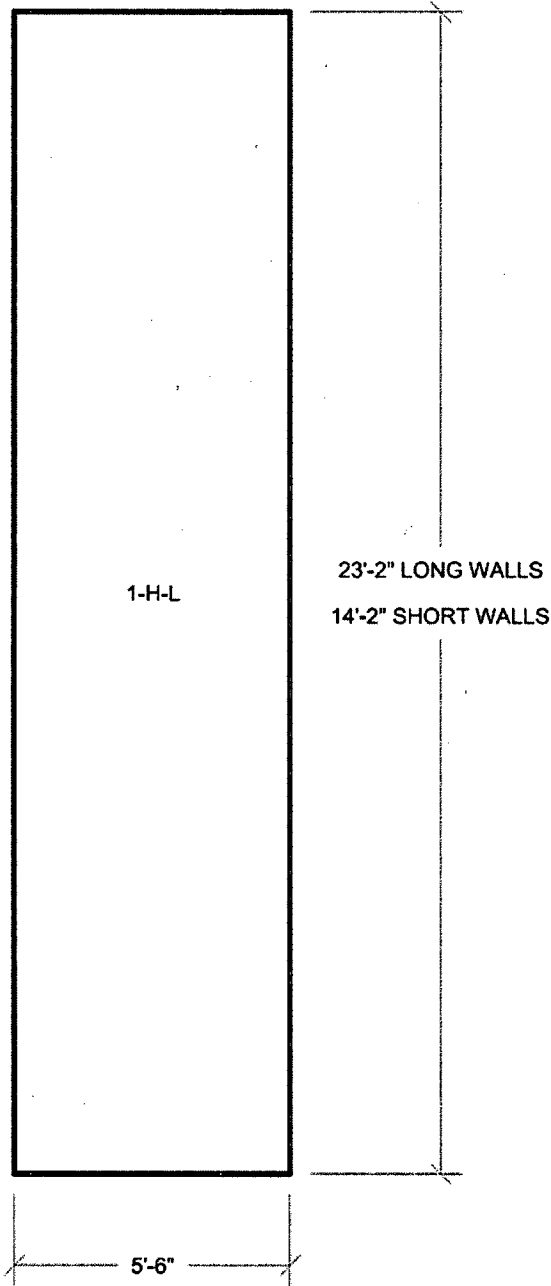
H.7-9: Access Region Walls Looking From Outside Horizontal Reinforcement Zones Near Side and Far Side Faces
